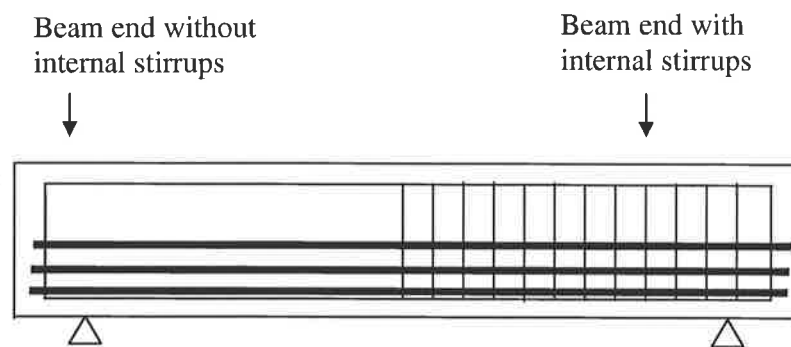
Beam test setup for longitudinal NSM plating.
